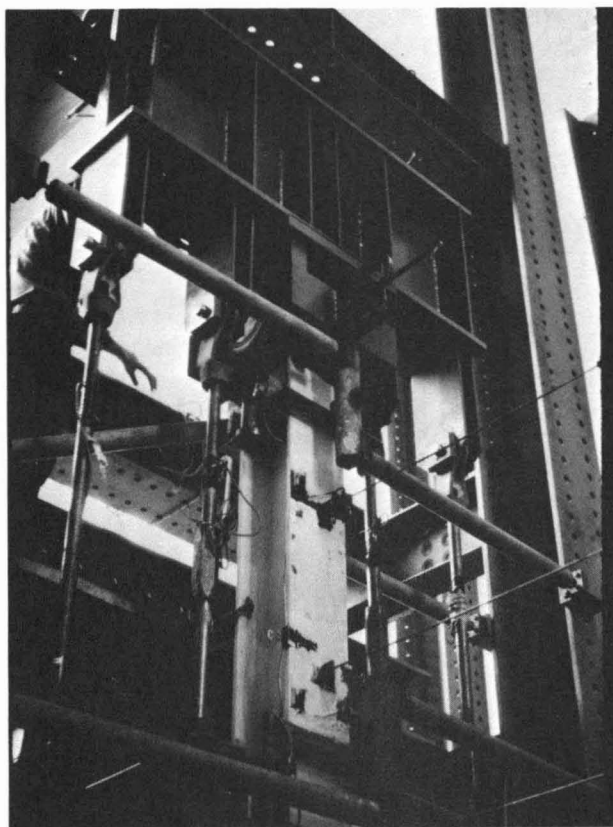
LOADING BEAM USED TO APPLY VERTICAL LOAD TO COLUMN TOP
